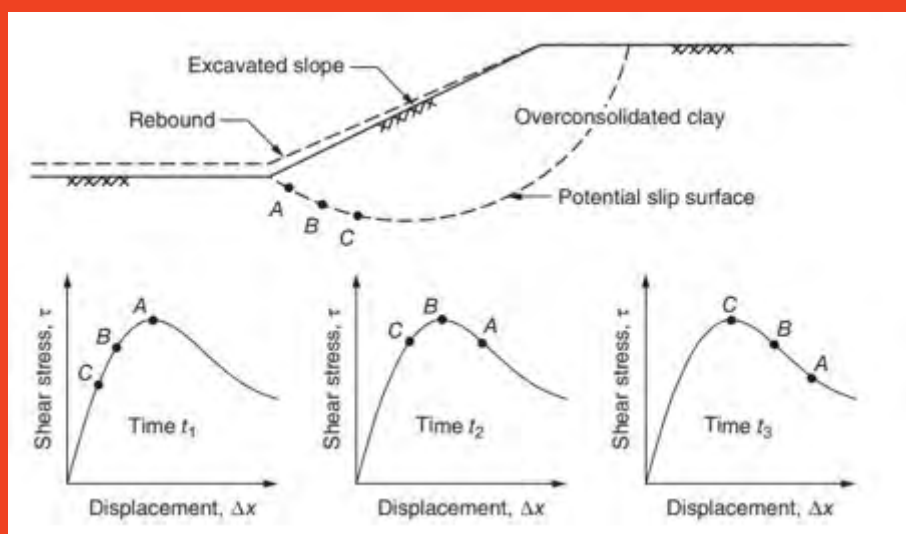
Mechanisms of progressive failure on an excavated slope in overconsolidated clay. From Duncan et al 2014, Figure 3.9.
